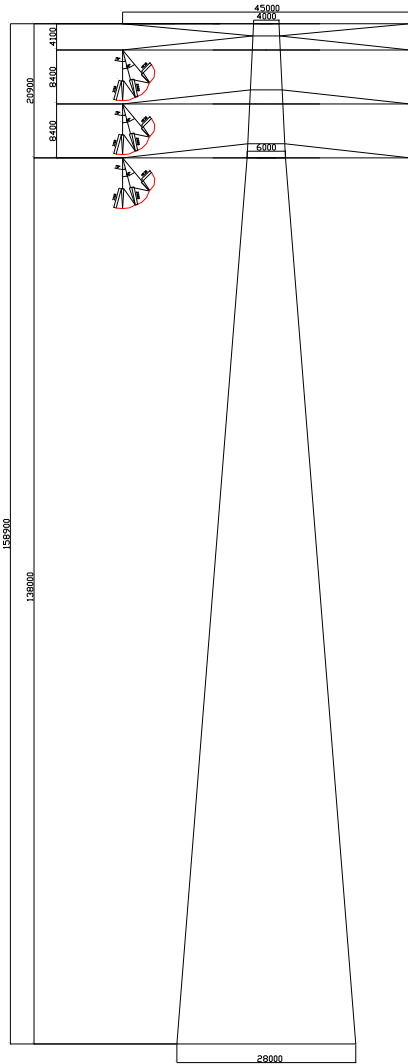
Meghna River Crossing Tower (Span: 1,200 m)
